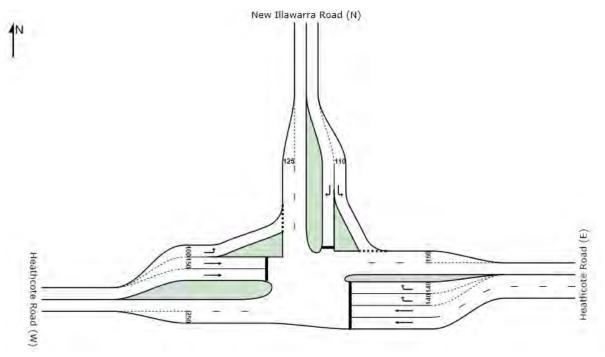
Existing Heathcote Road/New Illawarra Road intersection layout
